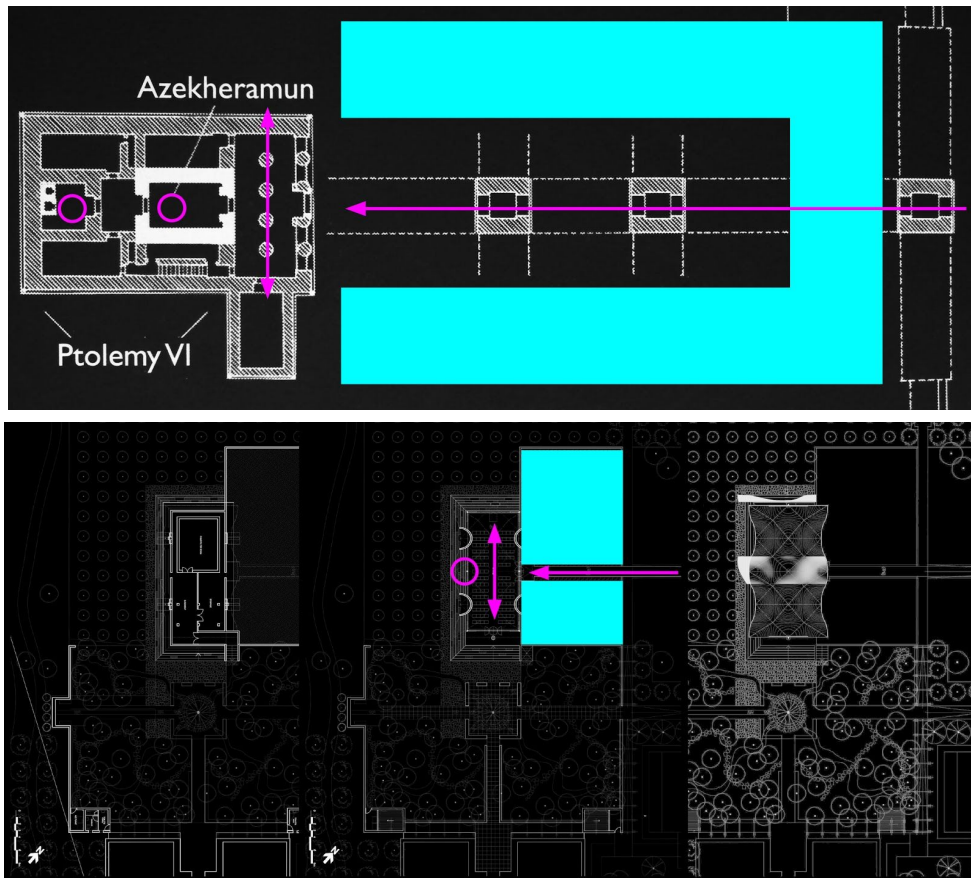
(top) Temple of Debod floor plan [img src: Arnold 2003], (above) Bosjes Chapel floor plans [img src: ArchDaily].
